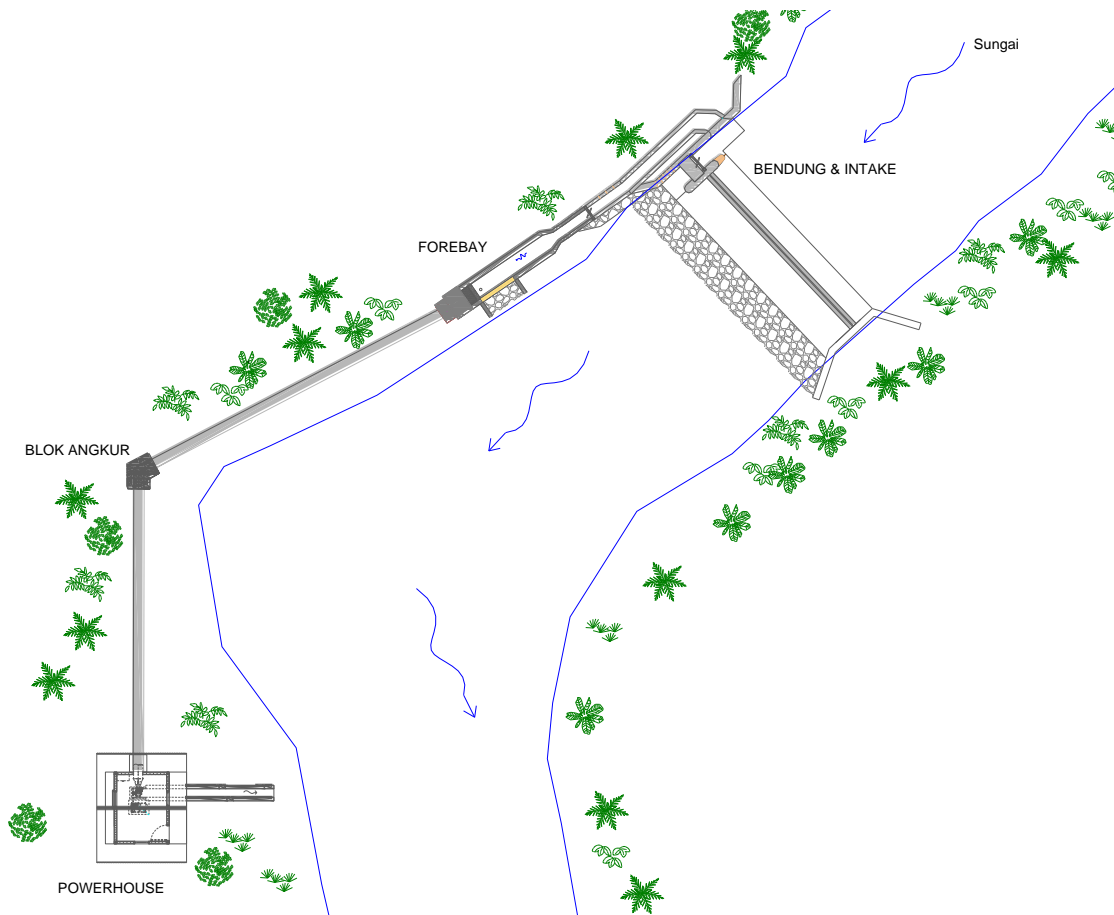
Plan view of a typical weir and intake structure. Note the combined settling basin / forebay tank positioned immediately after the intake enabling early cleaning of the water.
